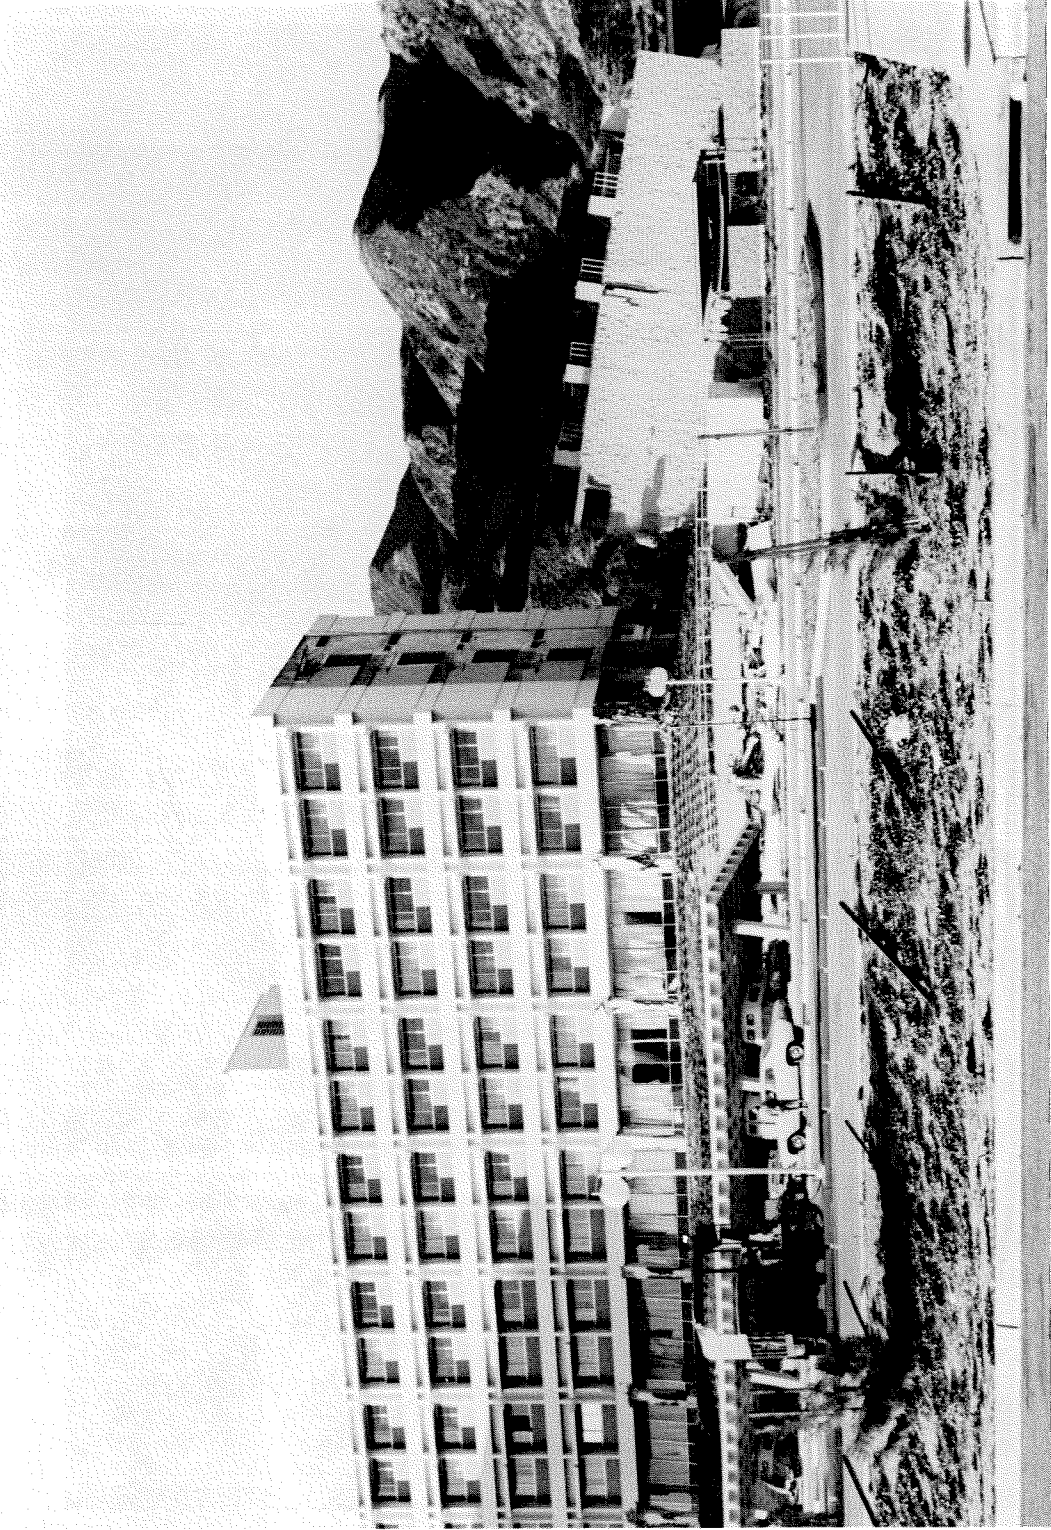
18 Olive View Hospital, looking north at the east end of the main building. Overturned stairwell at right, and collapsed canopy in left foreground.
